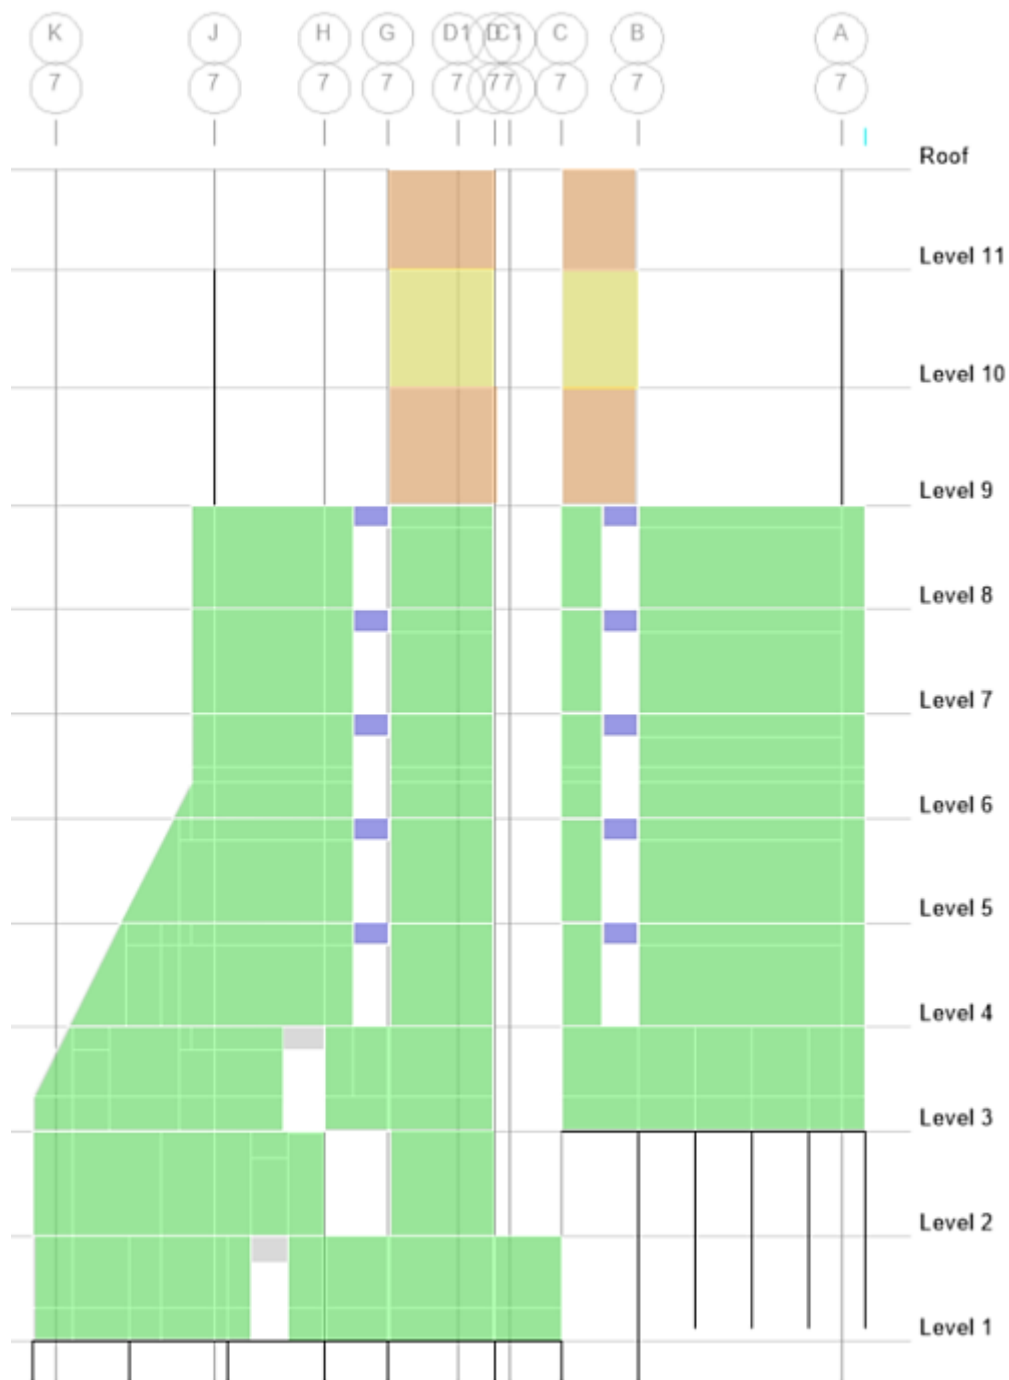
, Gridline 7 Transverse Direction Wall – North Structure
